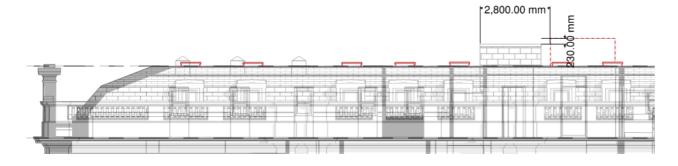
Existing elevation and proposed section overlay of the roof closest to Montague Street.
